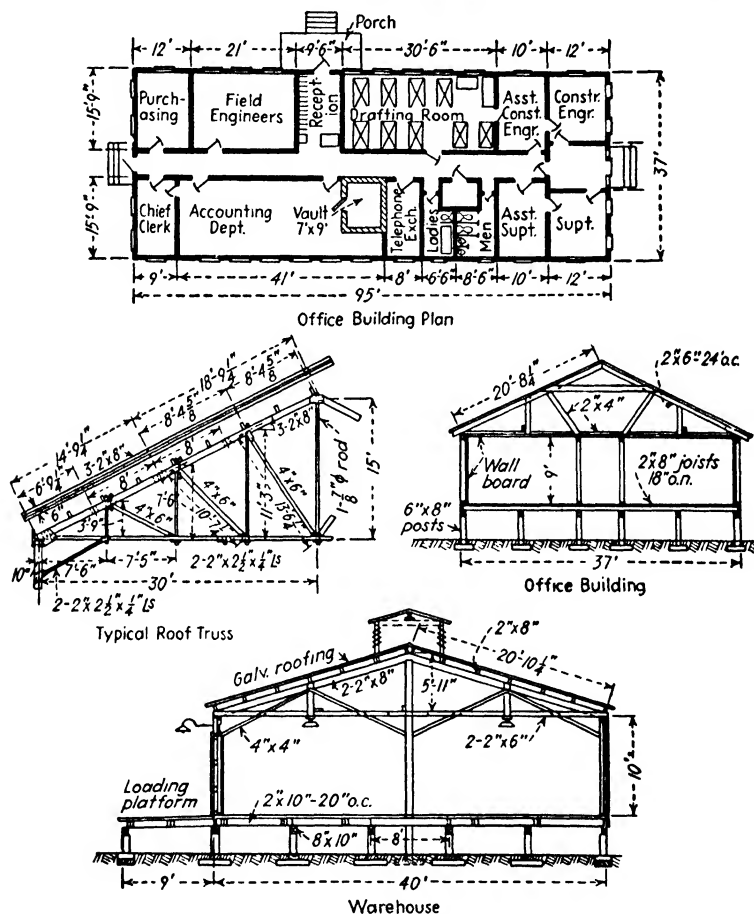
Typical designs of temporary construction plant buildings, including plan of office building, section of office building, and typical design of roof truss with span of 60 ft.
